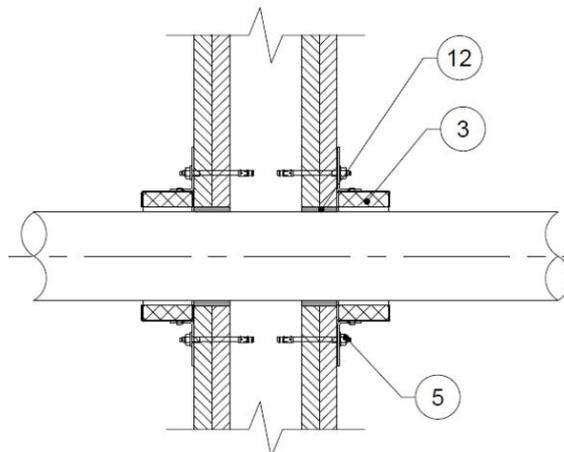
Sealant detail around uninsulated pipes in plaster board walls and Dintel walls option 2
